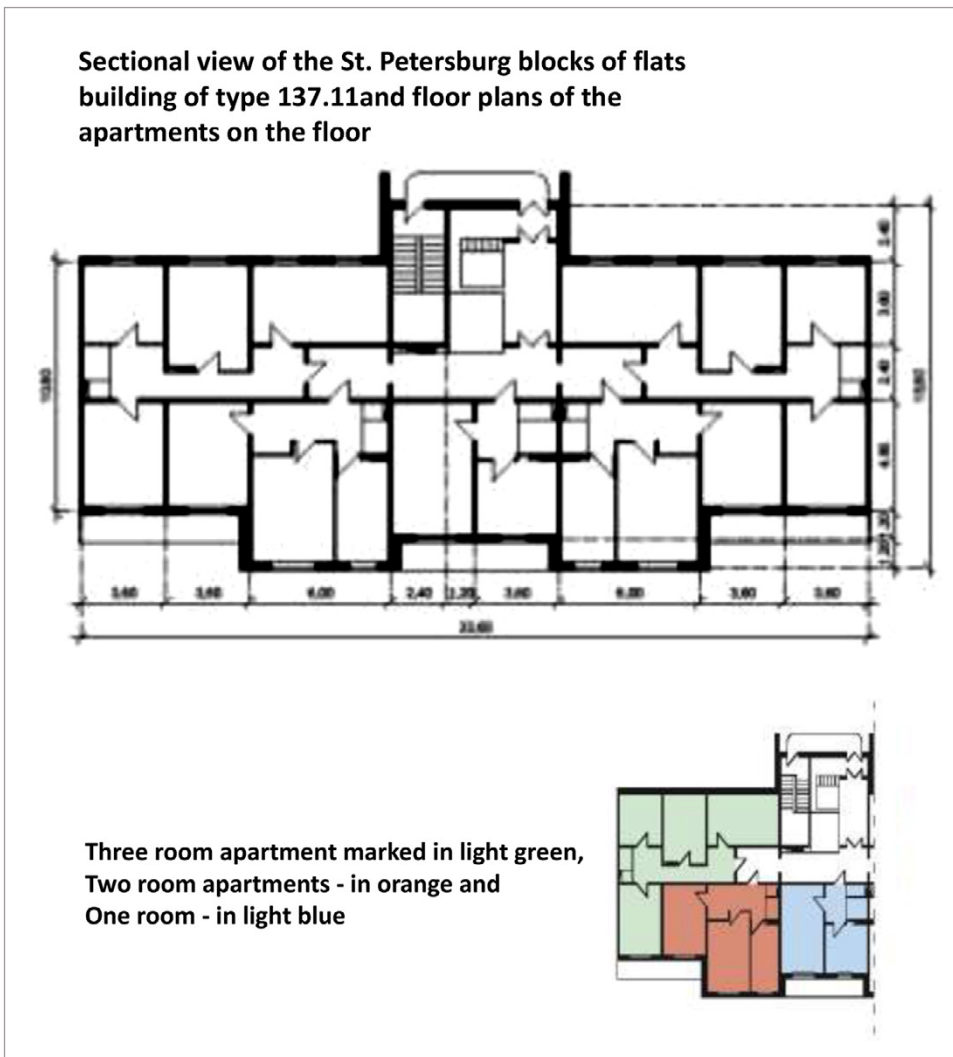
Sectional view of the St. Petersburg series 137.11 house and floor plans of the apartments.
